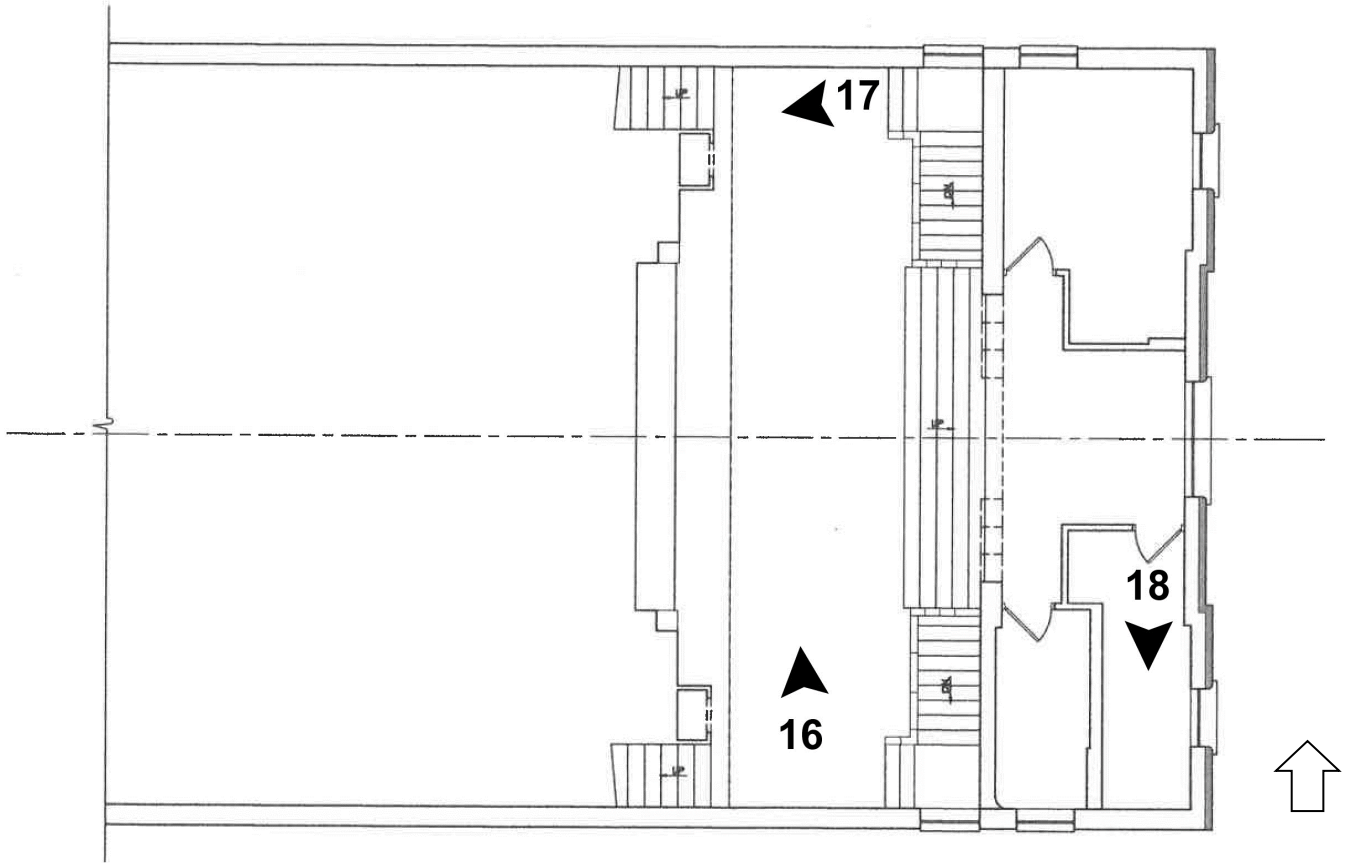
Second floor balcony plan and photo key. Base plan from Iola Theatre Association. Not to scale.
